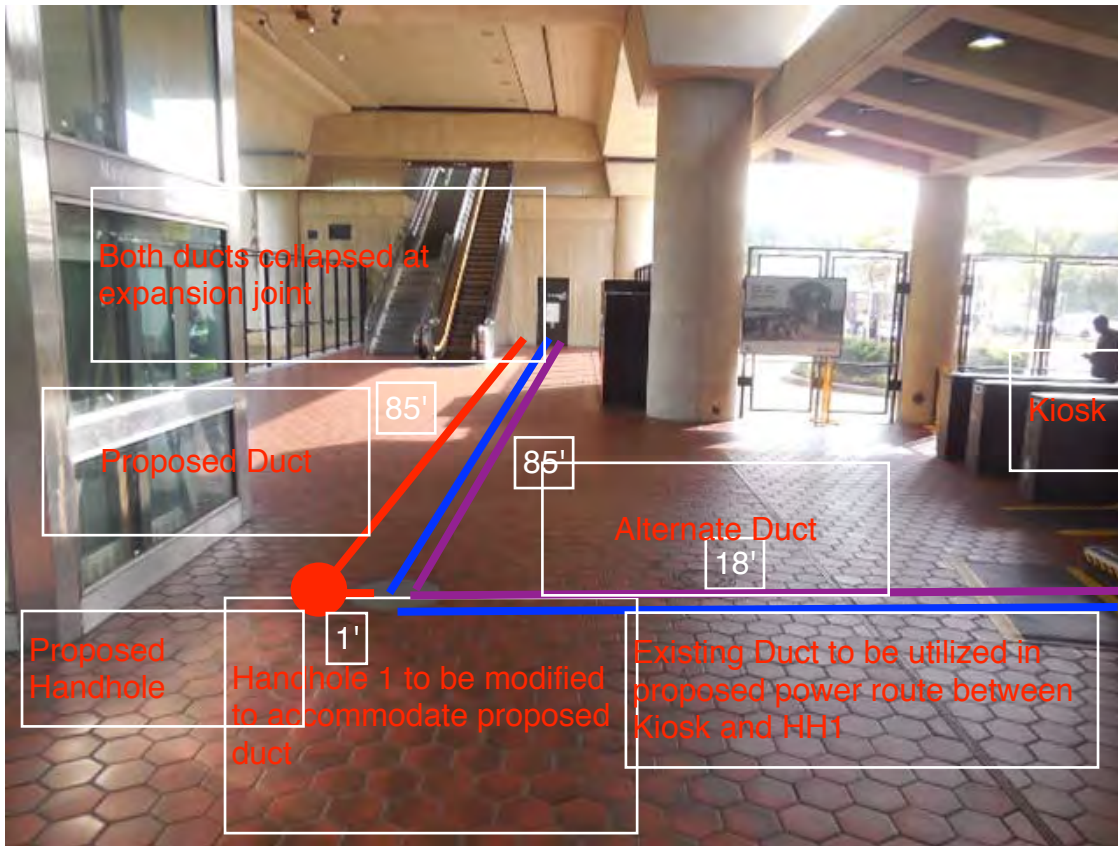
Existing, alternate and proposed ducts in back room corridor.
